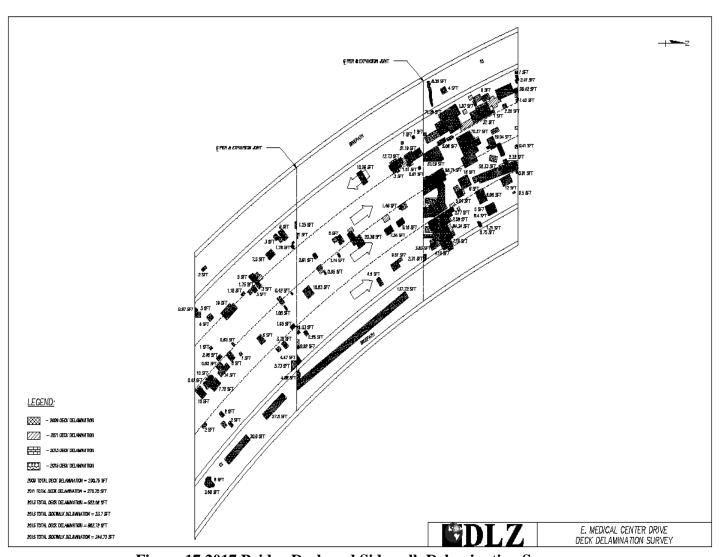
2017 Bridge Deck and Sidewalk Delamination Survey
